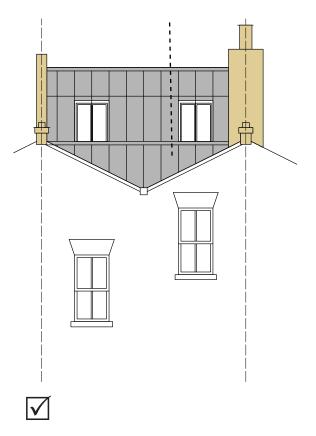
An apron of metal cladding such as zinc or lead can be used to create a new parapet while retaining the original butterfly roof profile
